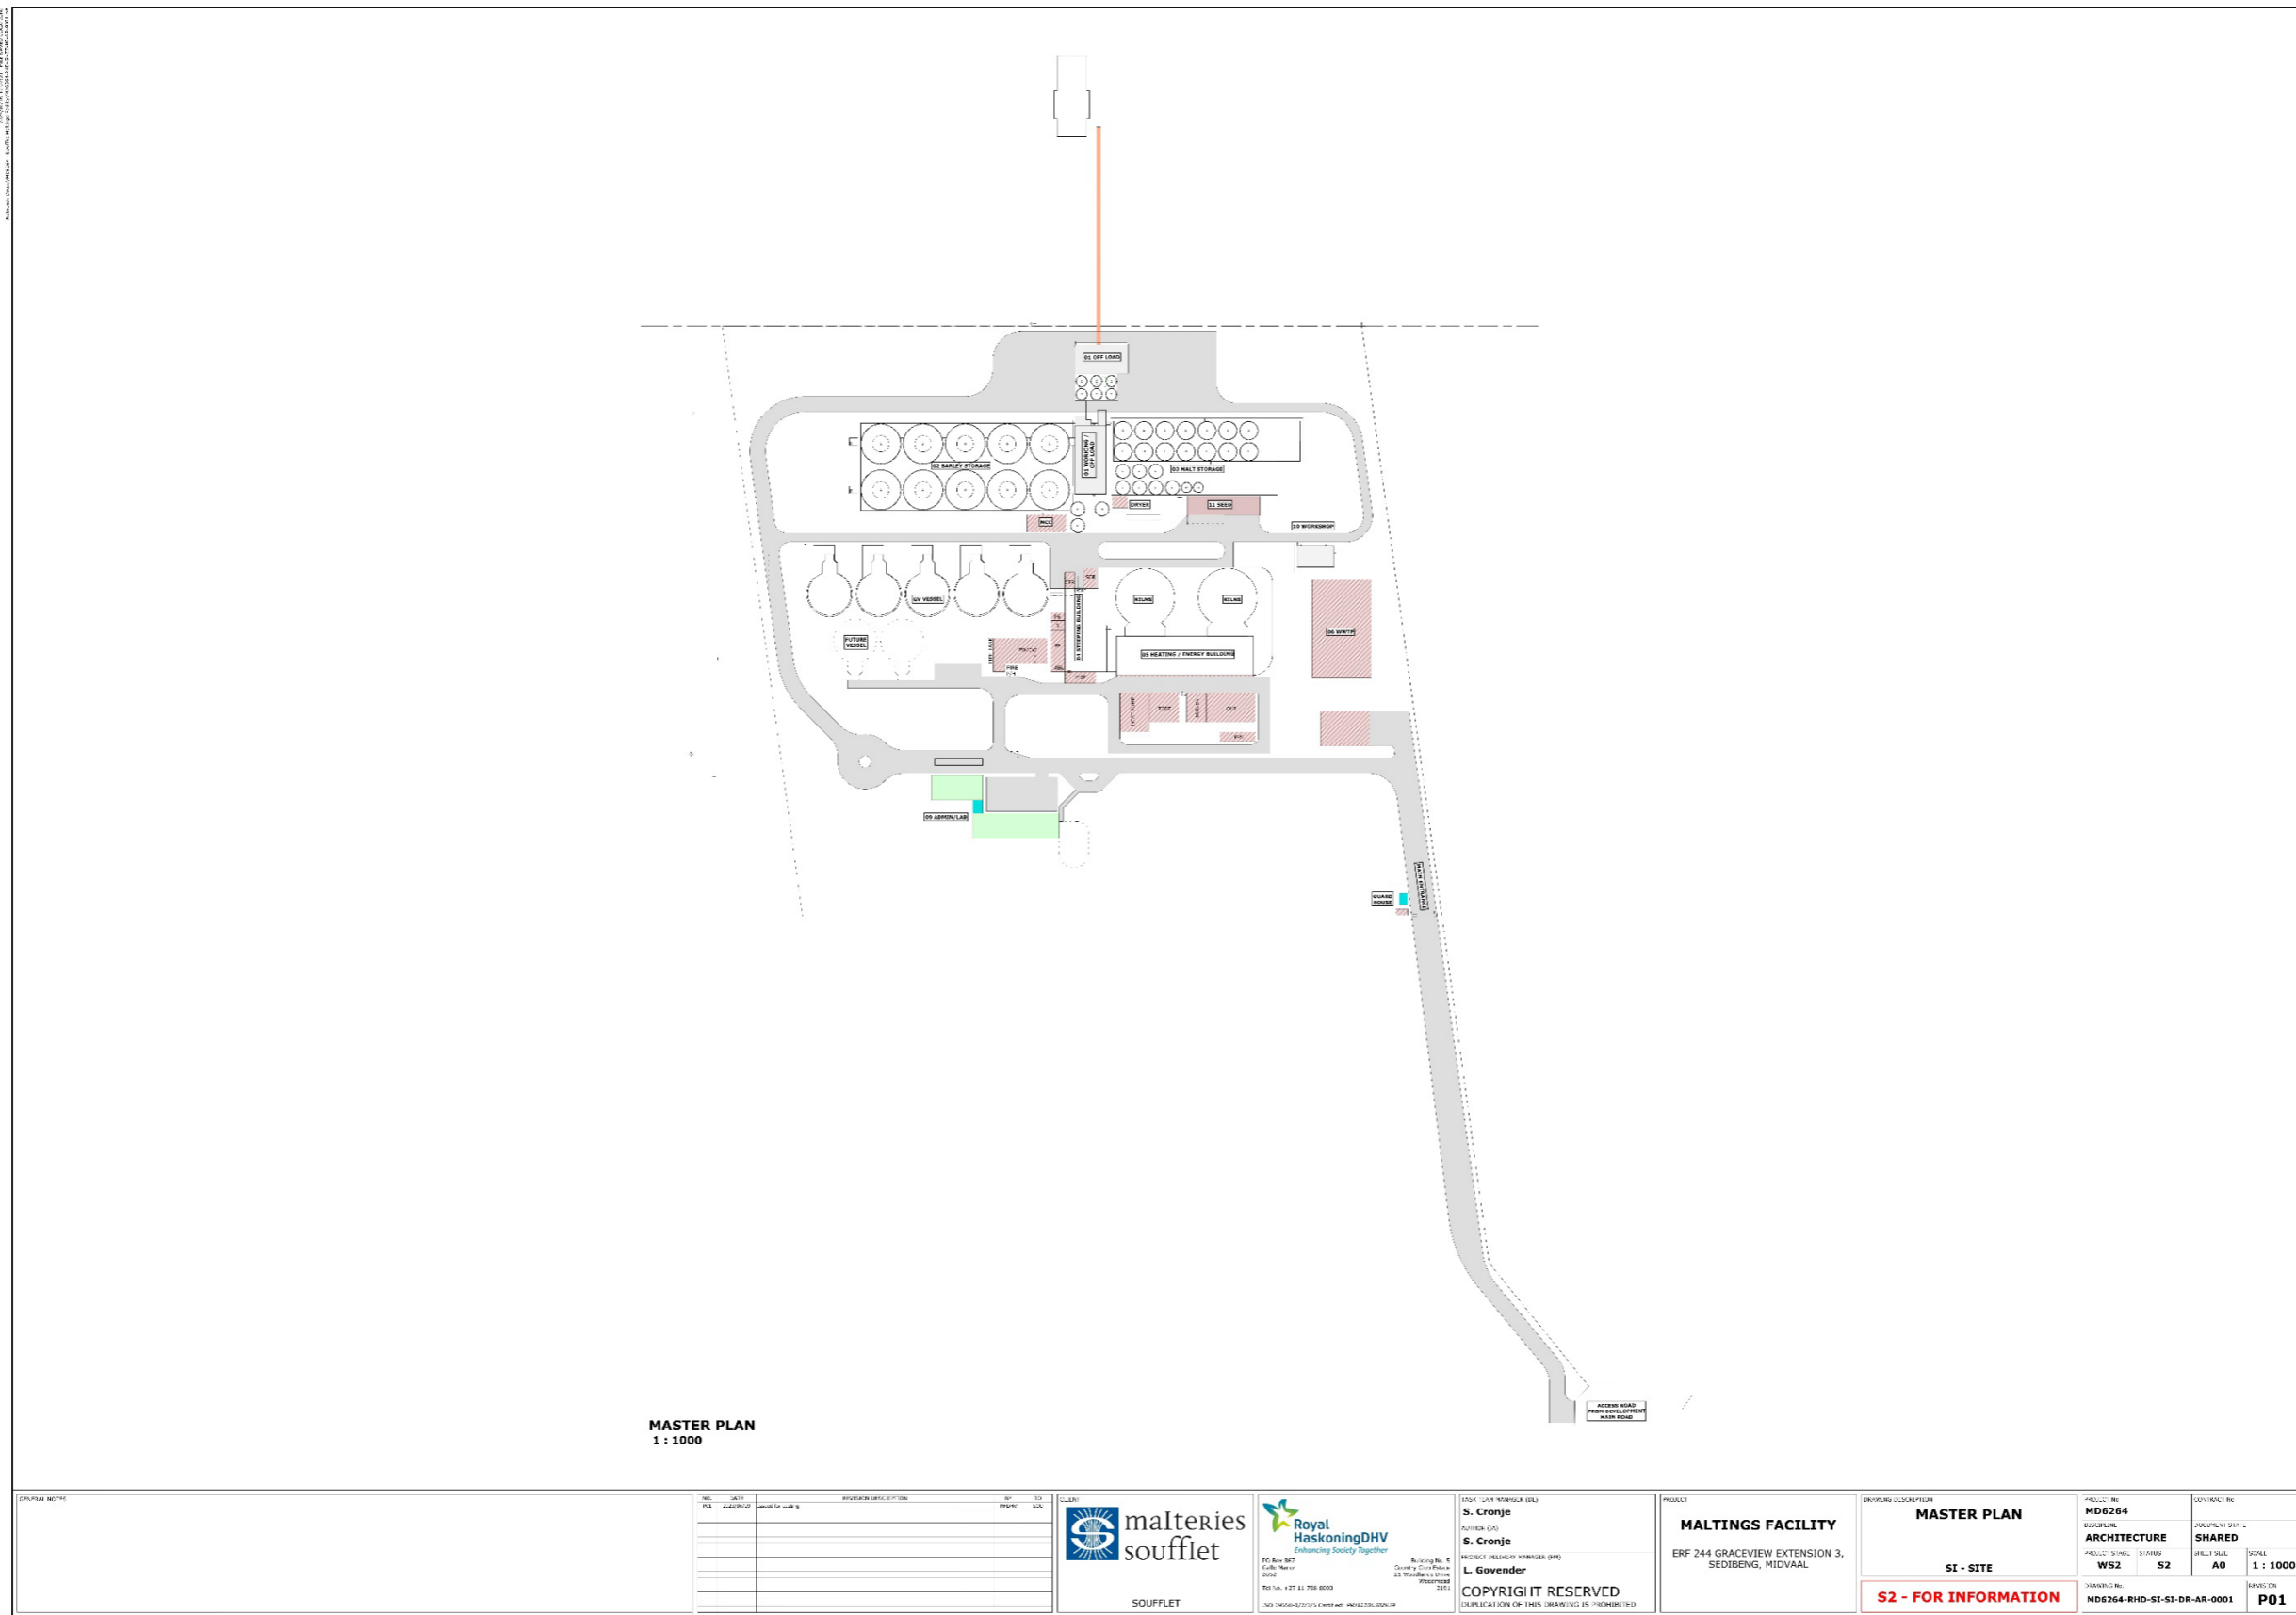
Detailed Layout of the Proposed Soufflet Malt Production Facility
